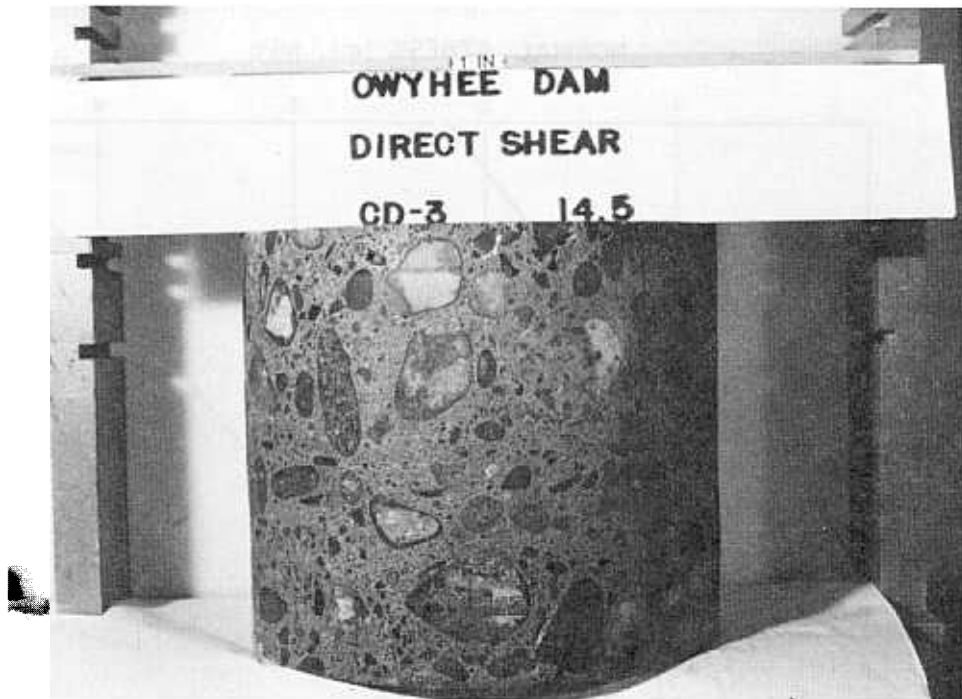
Typical direct shear test specimen before test. Owyhee Dam.
